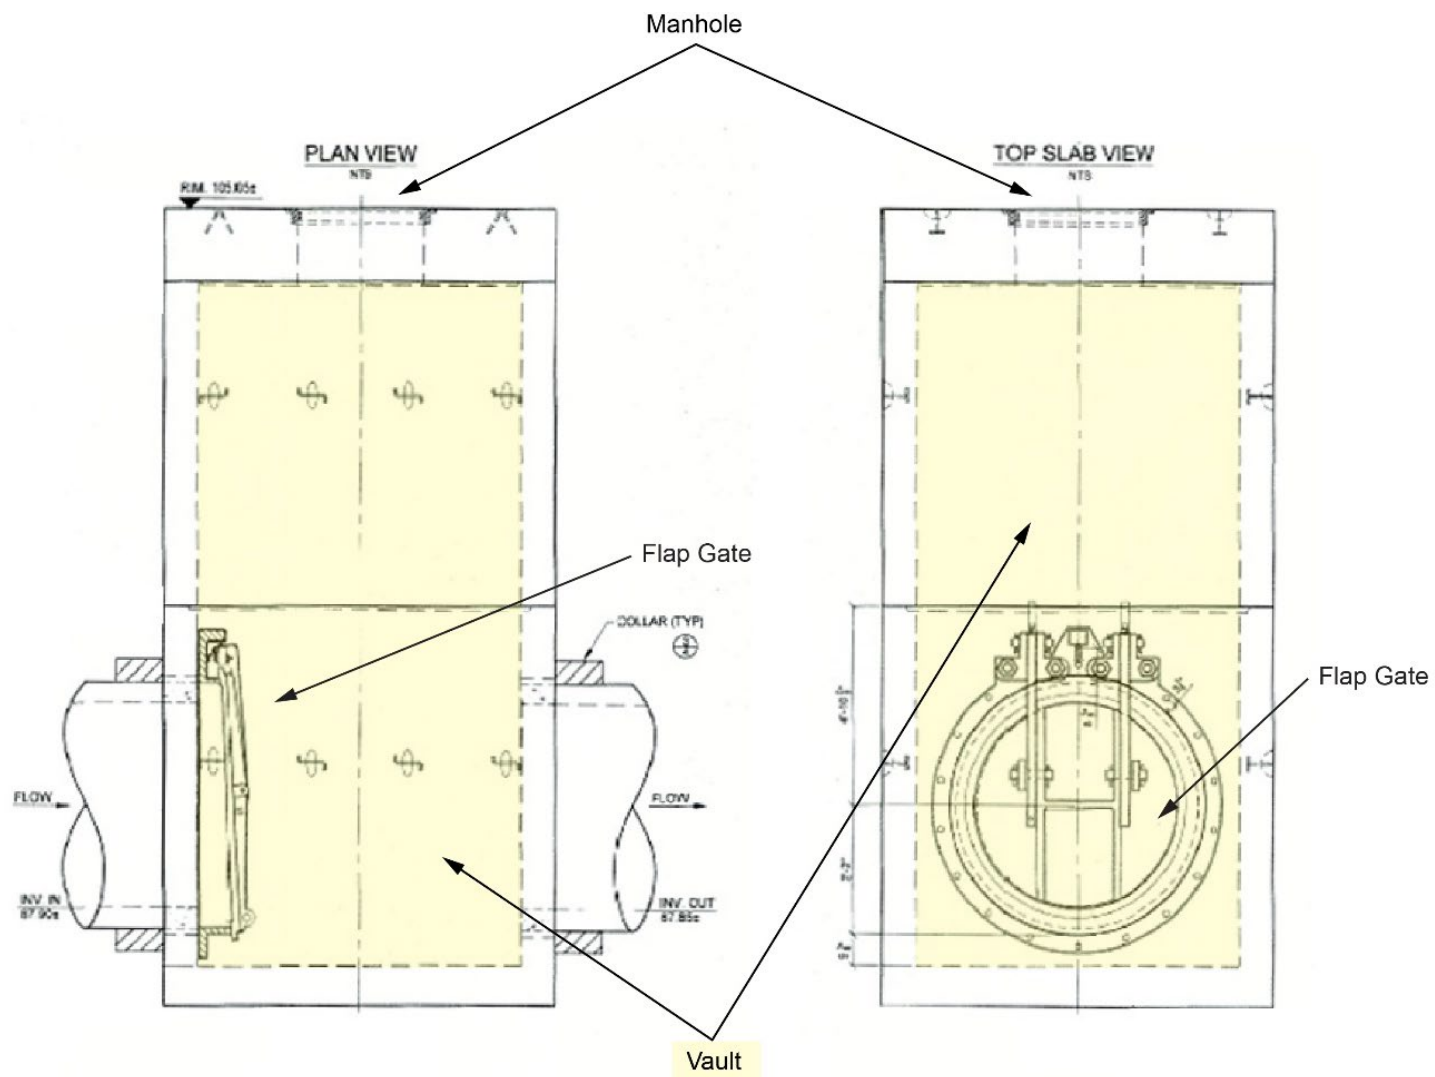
Typical View of Flap Gate Installation in Manhole Vault
